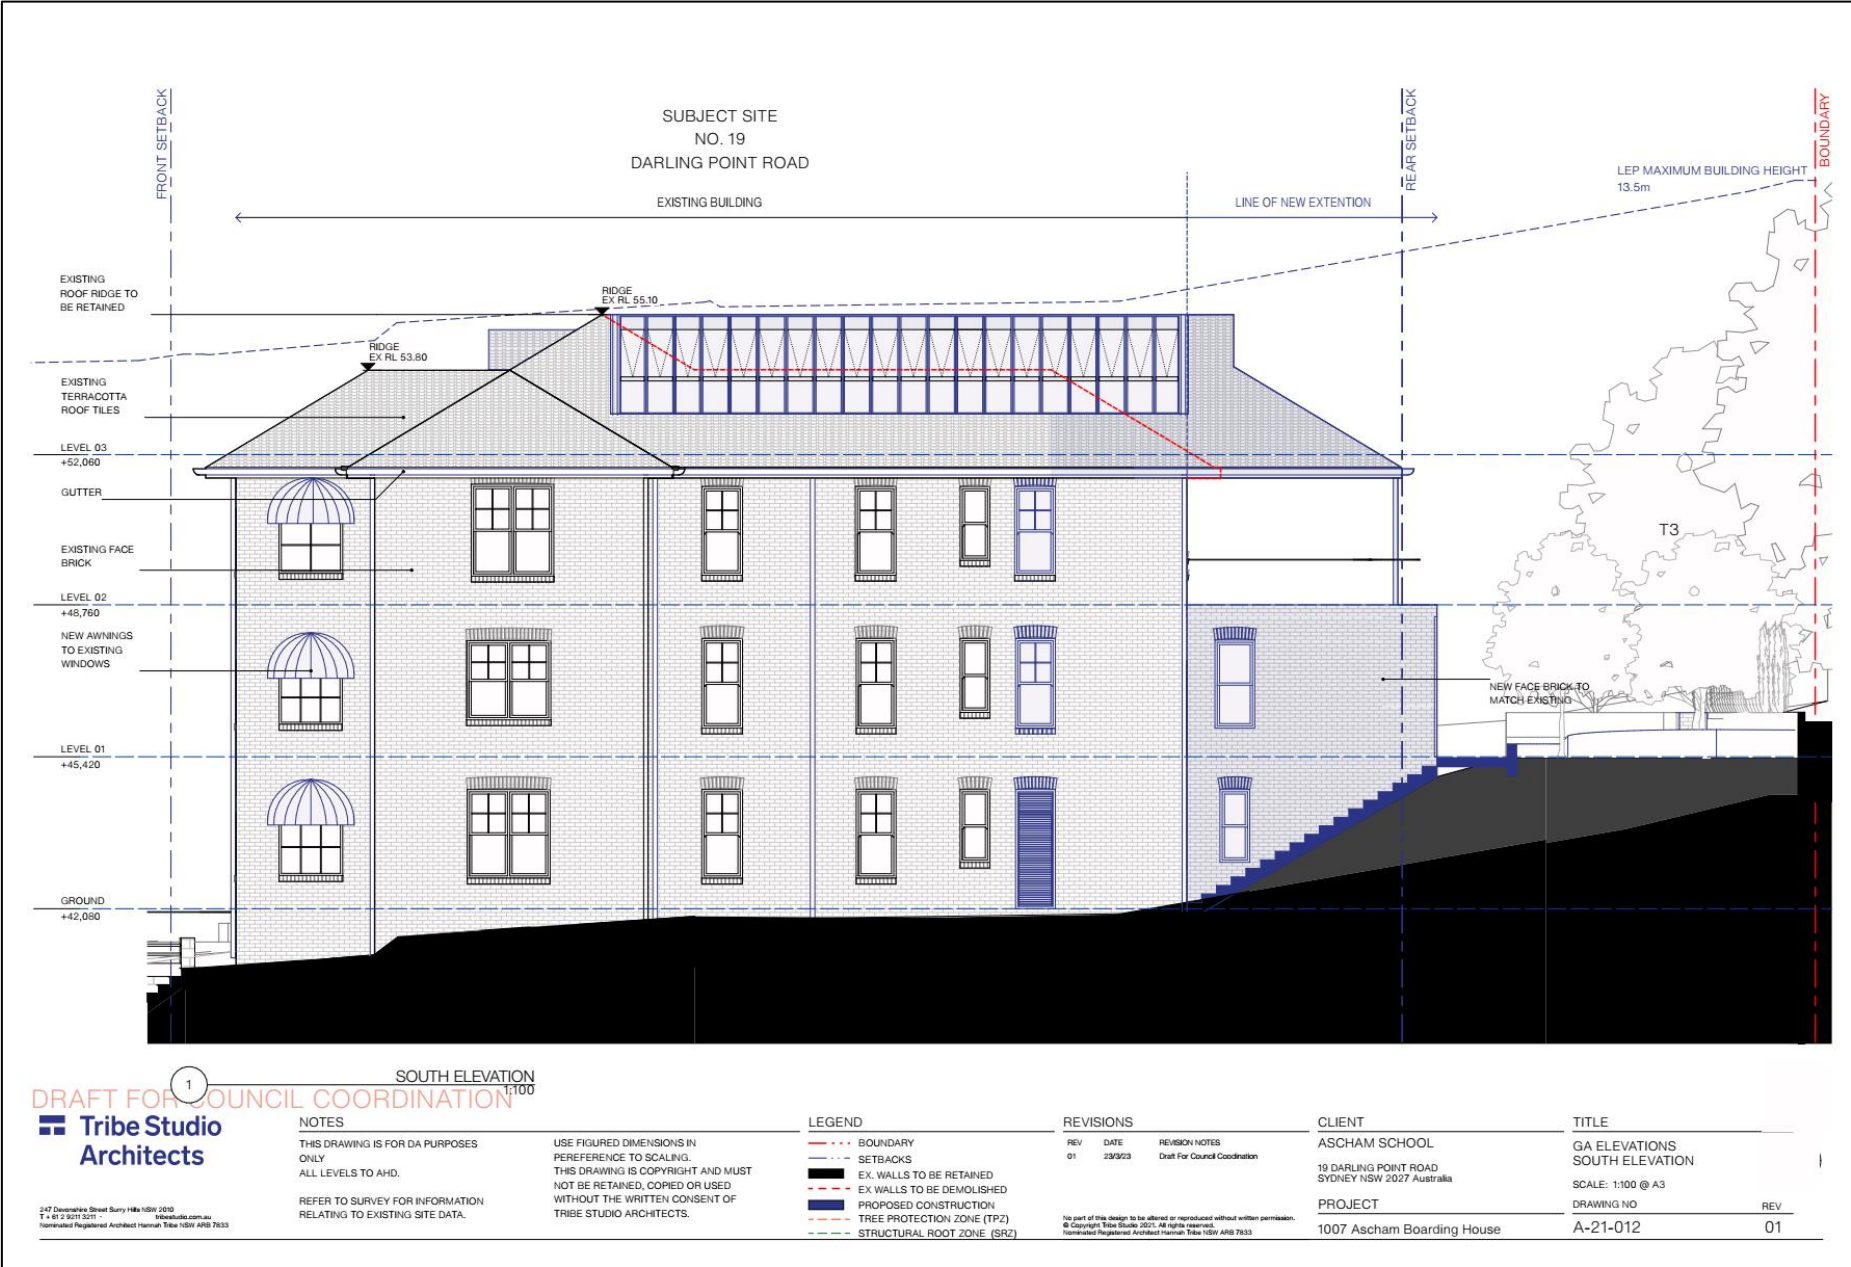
Showing the proposed south elevation for 19 Darling Point Road (plan courtesy of Tribe Studio Architects).
